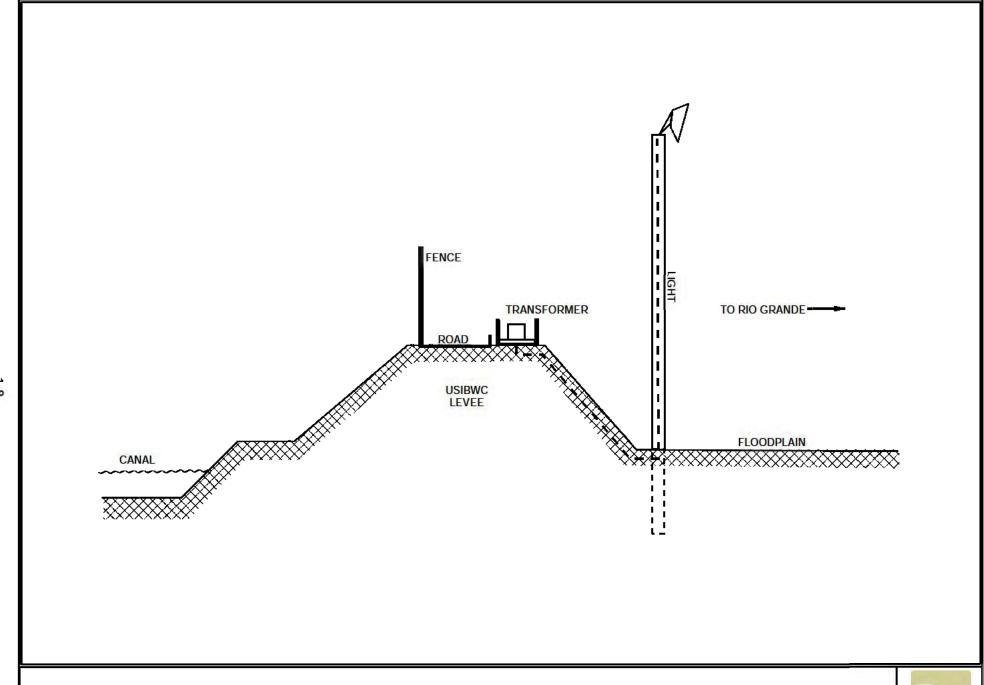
Typical Schmatic Cross Section, Floating Foundation Fence
